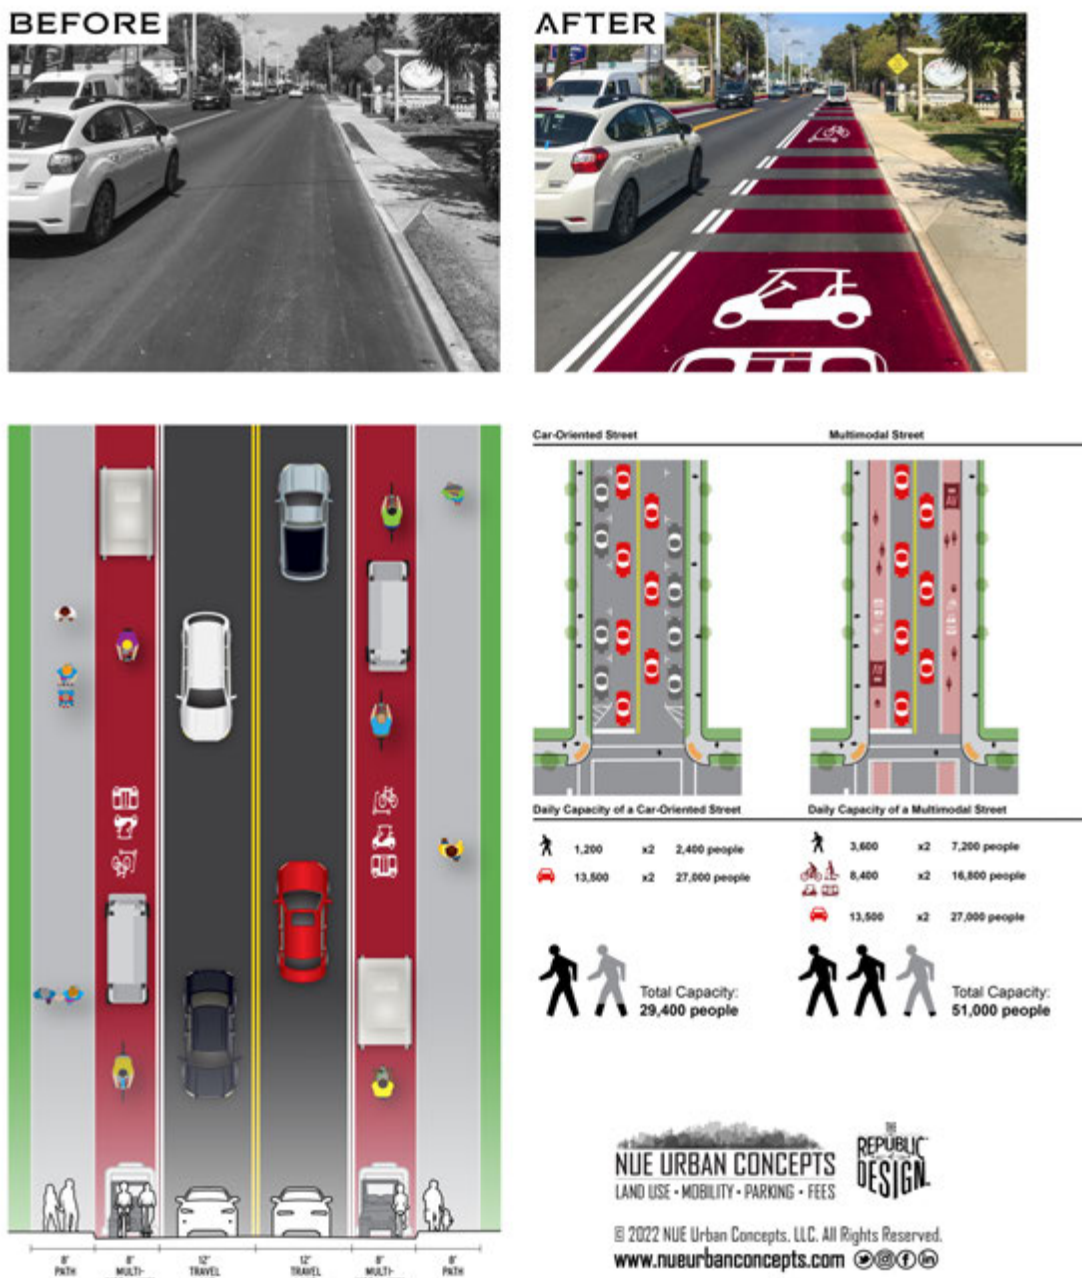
QUICK FIX SIDEWALK CONCEPTS
